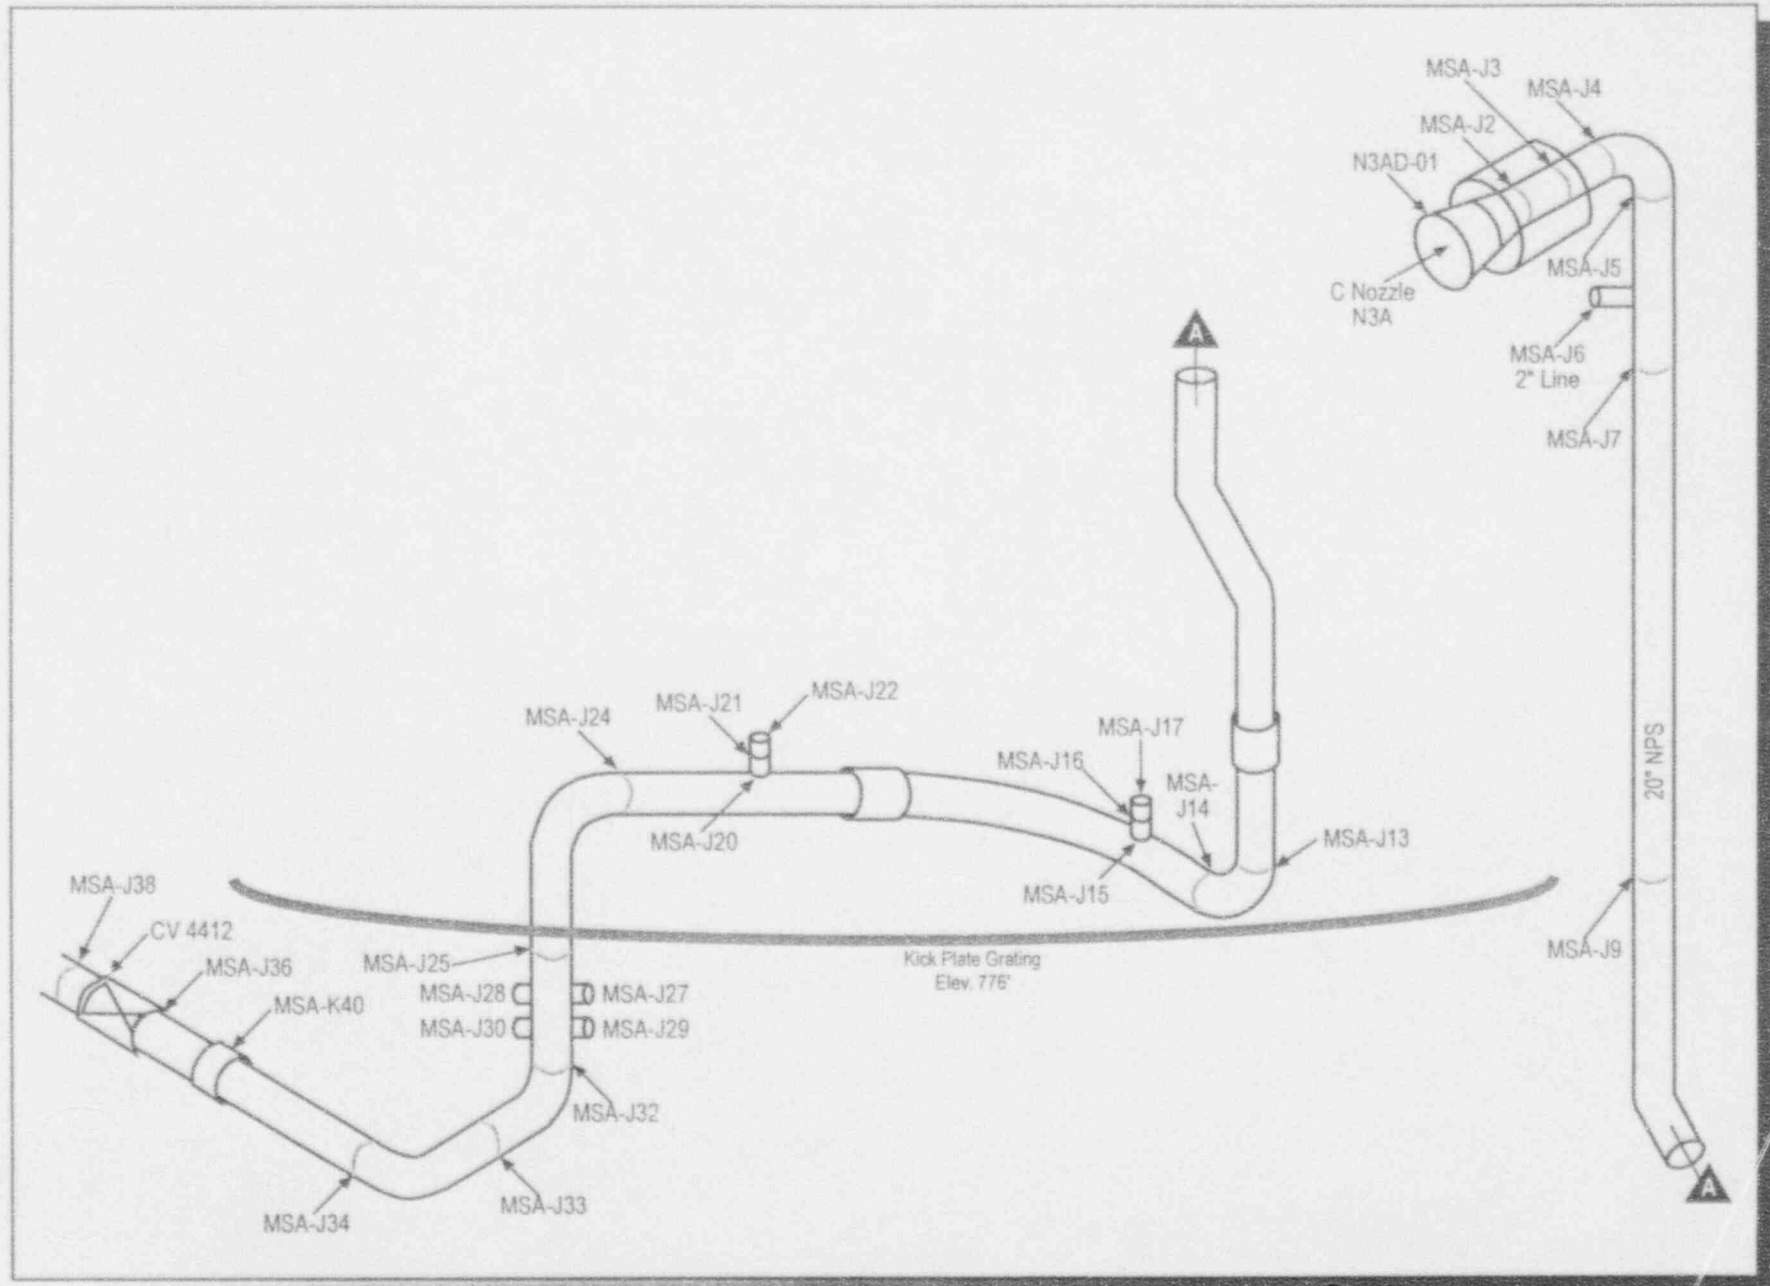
Weld Locations in Main Steam Line A
